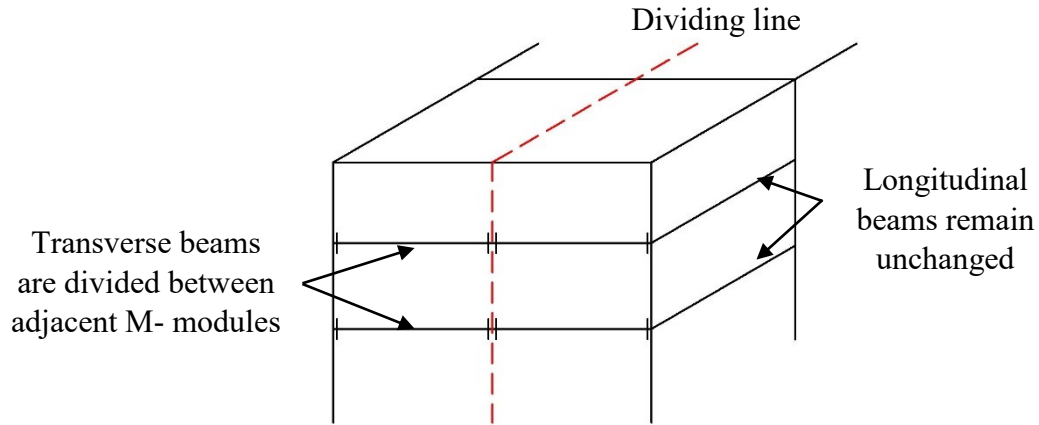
Longitudinal and transverse beams in AB-modules and M-modules
